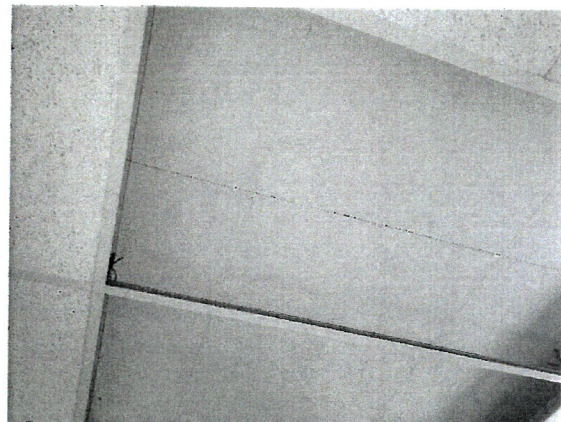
OSB Ceiling Tile – 2nd Floor Above Ceiling Tile (ND)
